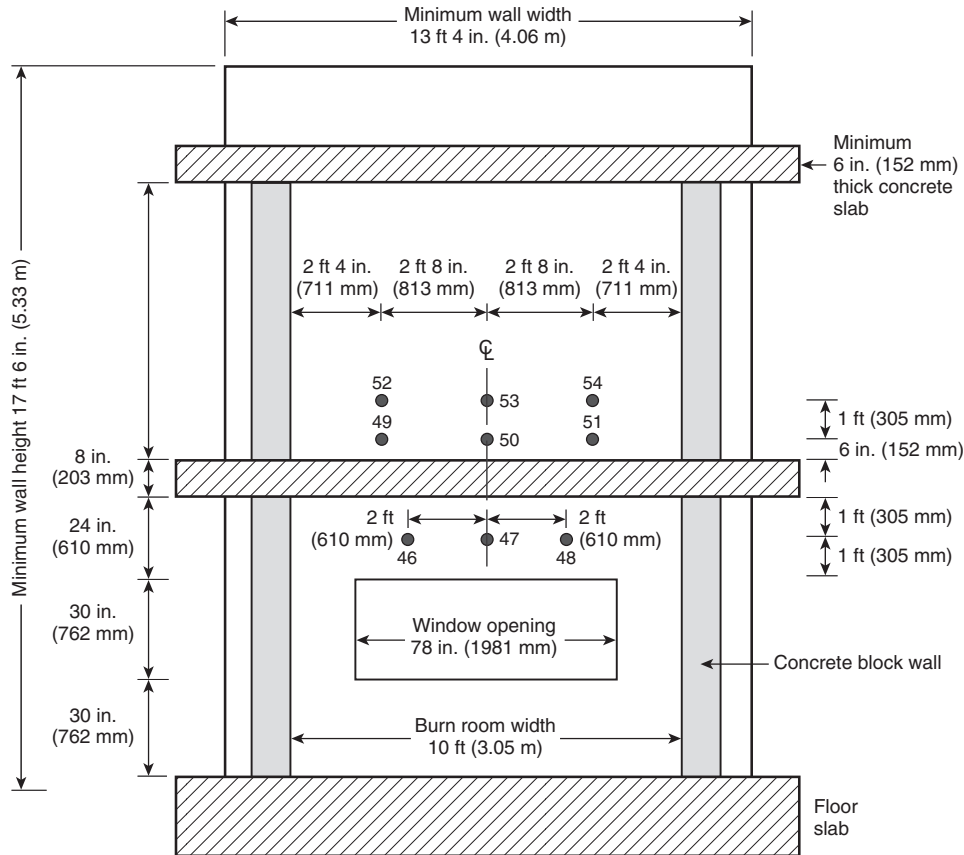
(a) Front View of Test Specimen Superimposed over Test Apparatus Thermocouple Locations.
